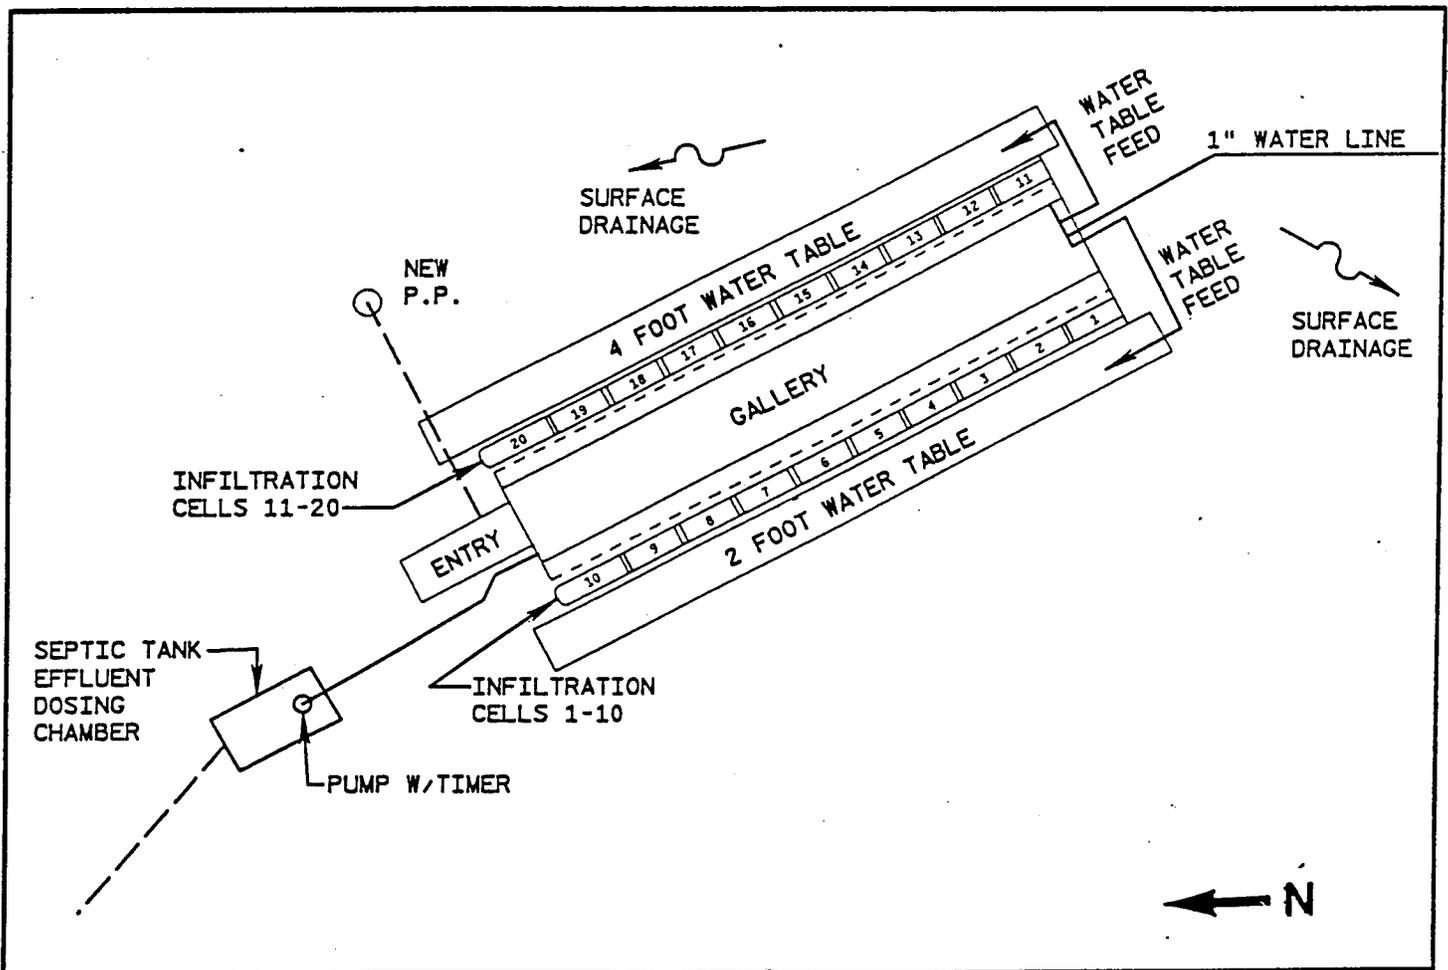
Plan View of the Lysimeter Station Facility
